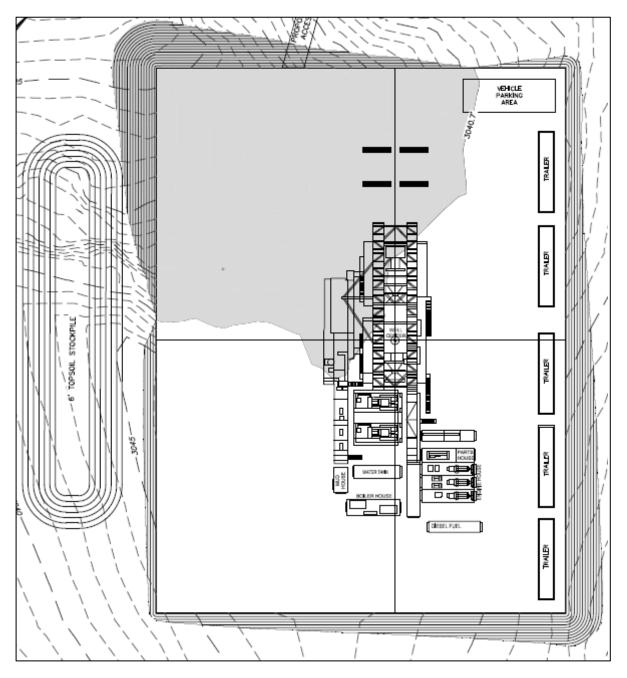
Typical drilling layout for new grass roots, replacement, and/or re-entry single well pad during construction.
